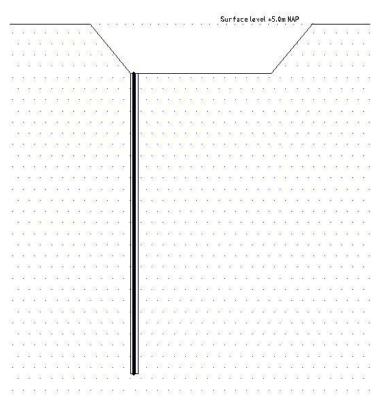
Phase 2 - Driving of Sheet pile wall
